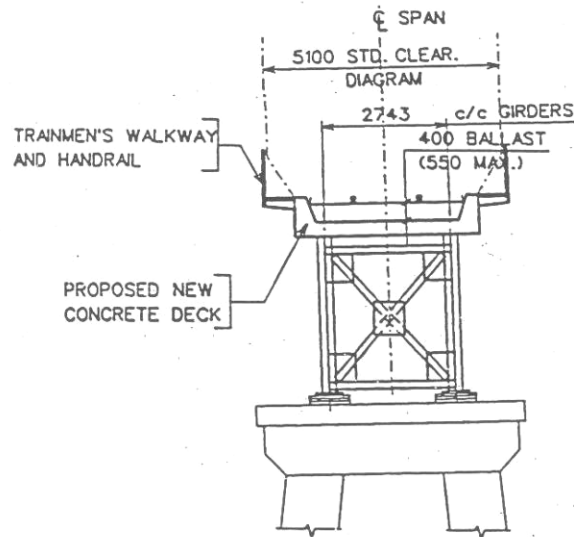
Steel Deck/Plate Girder Railway Bridge with Prefabricated Prestressed Concrete Slab
